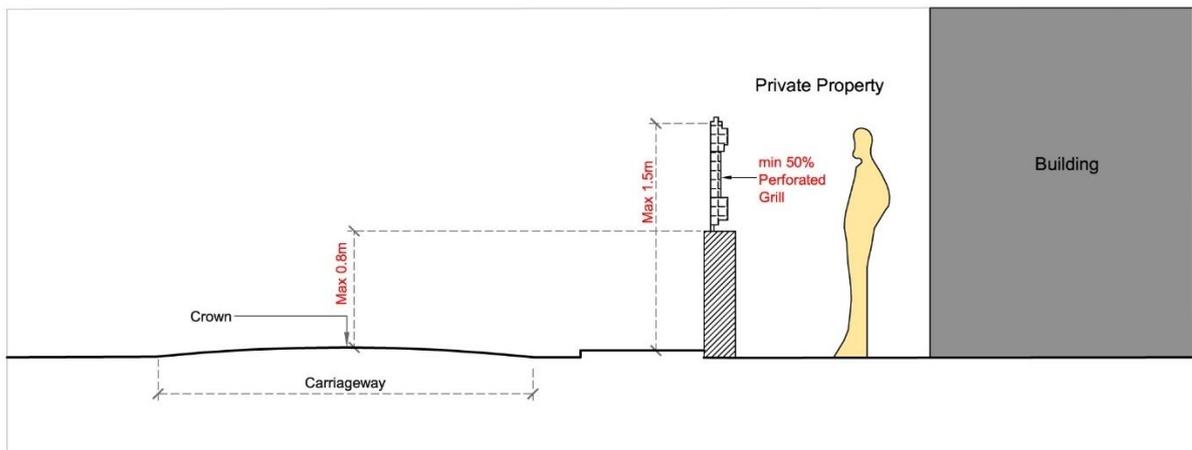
Boundary Wall / Compound Wall for Building
